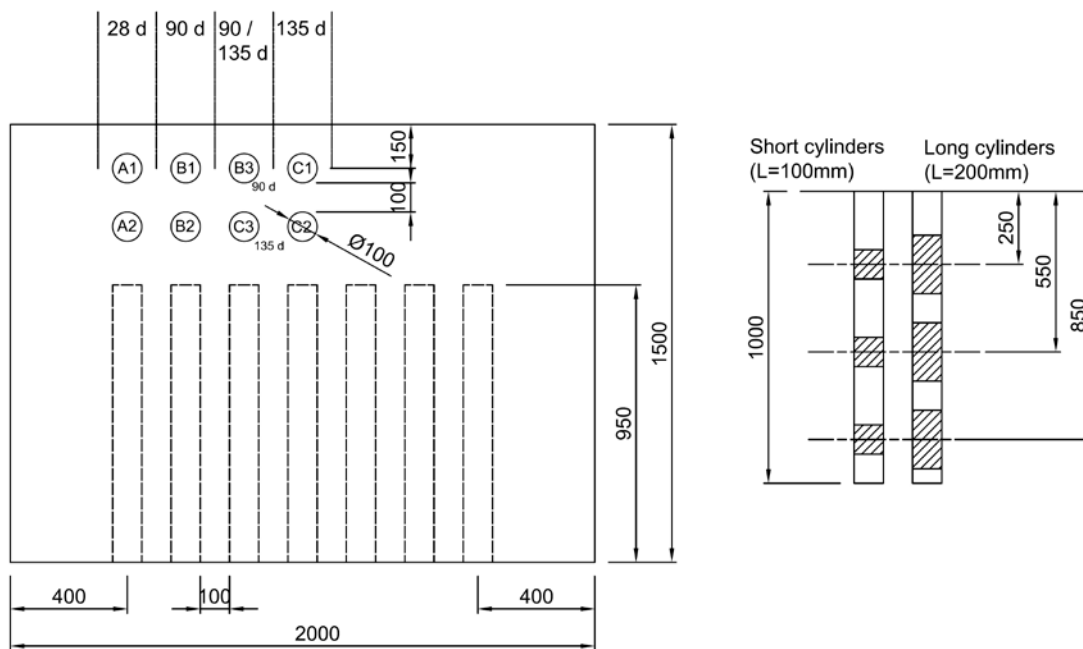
Plan for drilling of vertical cores from the concrete monolith (left) and extraction of test specimens from the cores (right).
